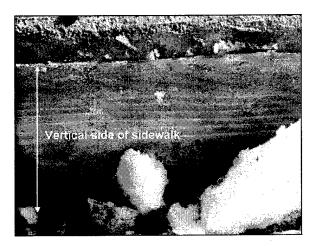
Sidewalk profile displays satisfactory consolidation, despite low slump.
